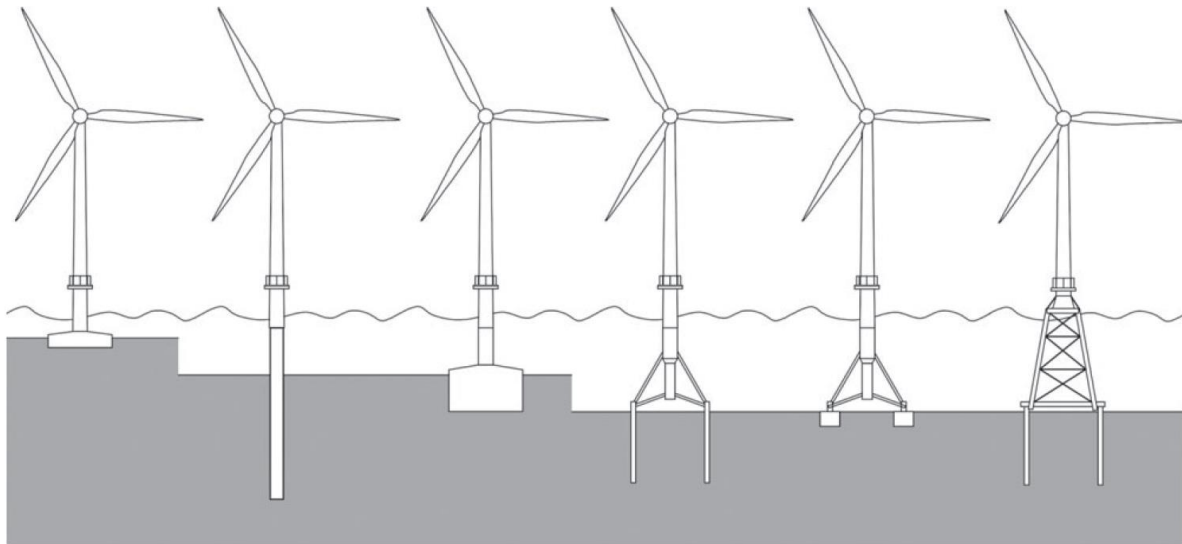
Some typical foundation concepts: Gravity-based foundation, monopile foundation, caisson foundation, multiple foundation, multi-caisson foundation and jacket foundation, from left to right respectively (Kallehave et al., 2014)
